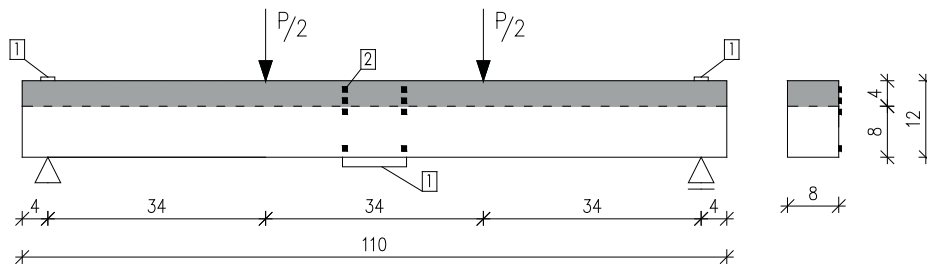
Loading scheme and cross section in tested beams.(Sadowska-Buraczewska,2012)
